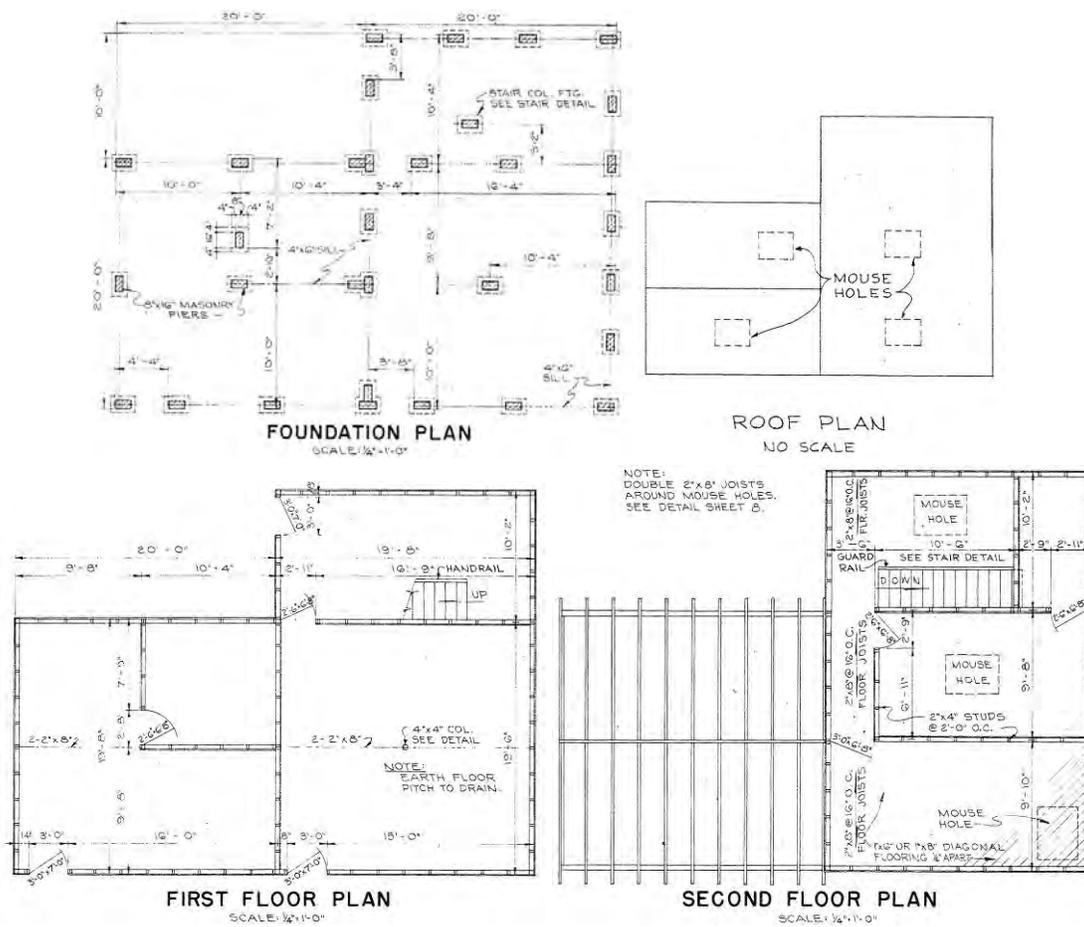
"Combat in cities" course type "A" building foundation, floor and roof plans, 1952 (standard drawing 28-13-01 sheet 3 of 9; "Combat in cities" course, type "A" building, plans, elevations, and details; 20 June 1952).
